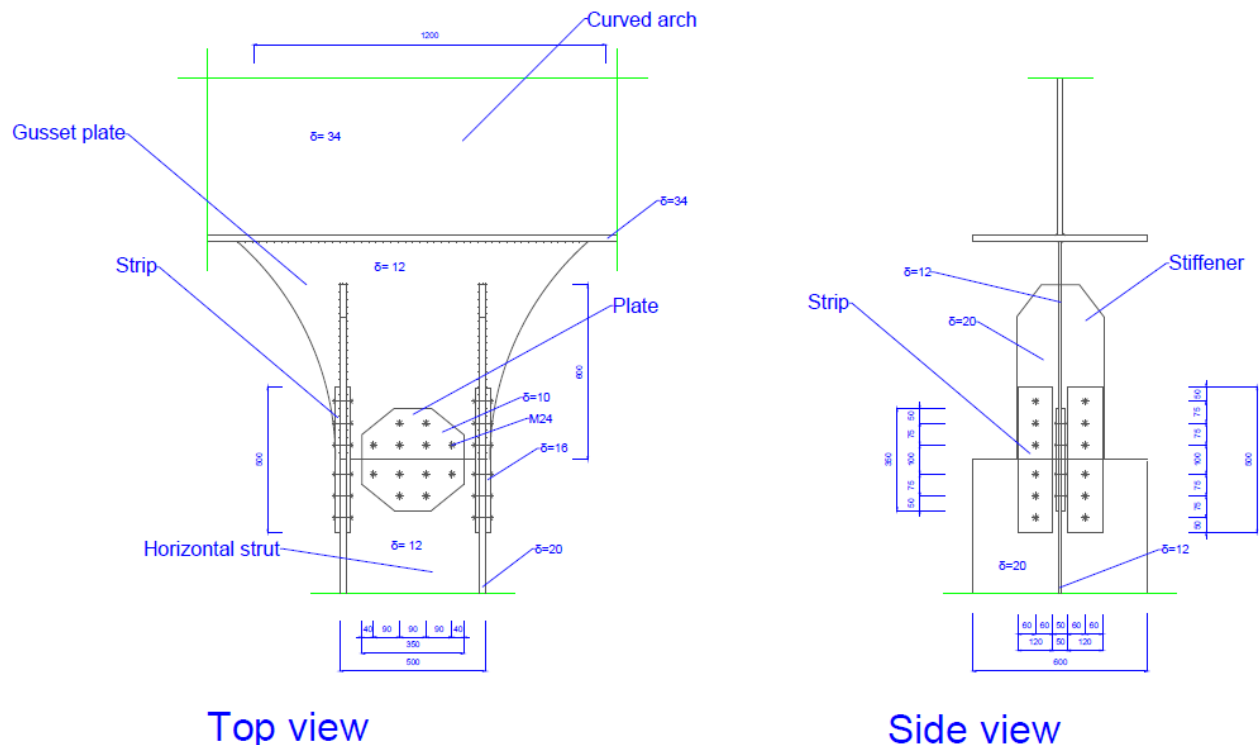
Modeled connection strut-arch (steel grade S235 dimension in mm)
